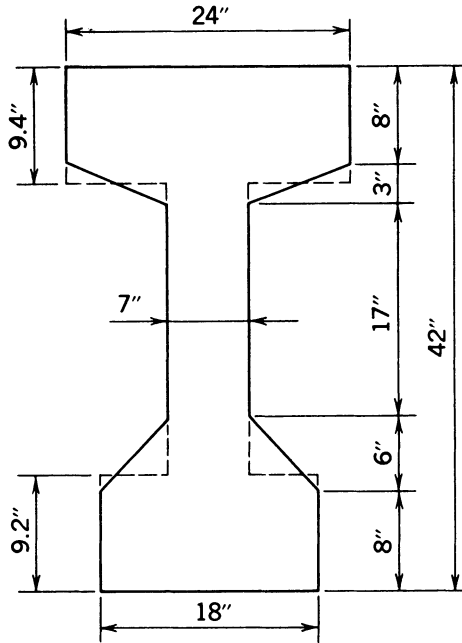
Cross section of a beam, I.P. 9-11.
